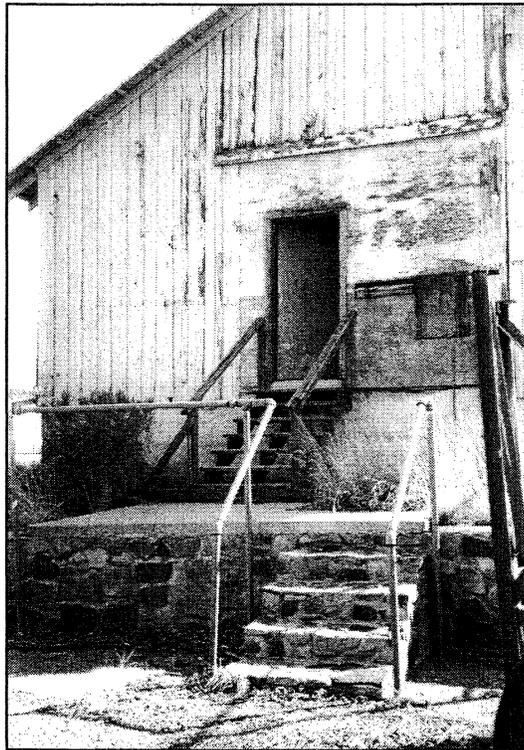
STONE RETAINING WALL AND STAIRS, CONCRETE LANDING, AND WOODEN STAIRS PROVIDING VERTICAL ACCESS TO THE WEST DOOR (PHOTOGRAPH BY JANET PARKHURST, JANUARY 2005).
